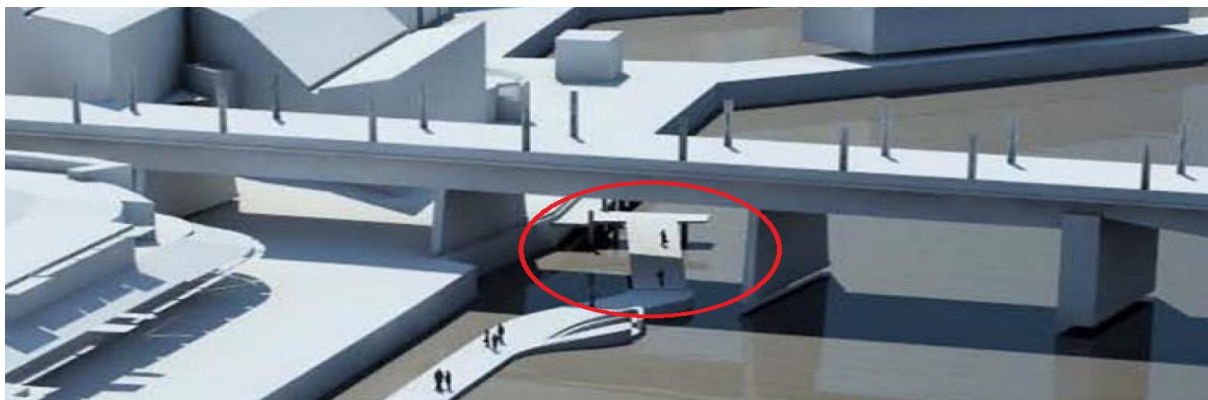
Model view of ANMM Floating Walkway (Southern Elevation)
